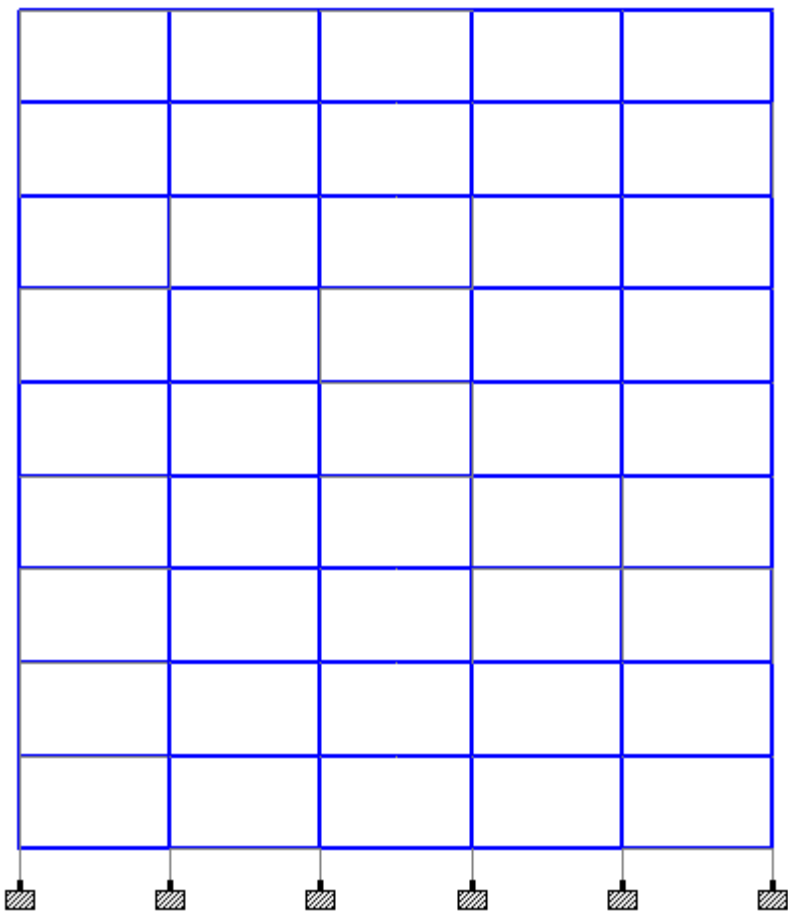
Model 8.3: Masonry infill as surface element – Front View
